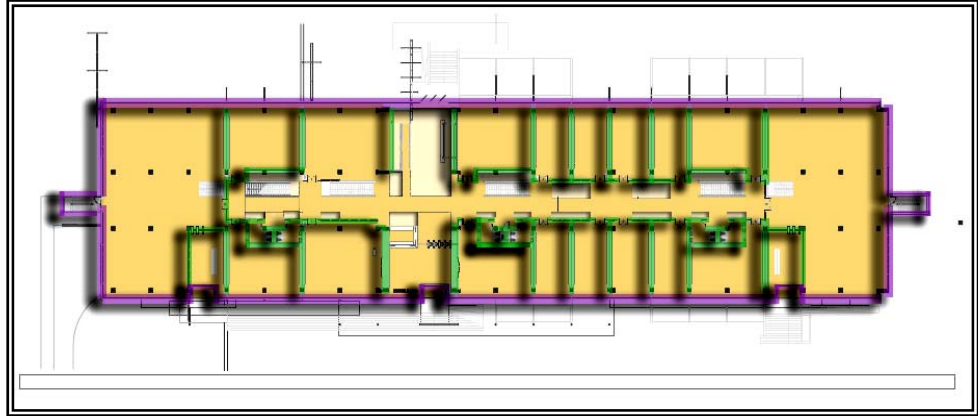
Adopted ground floor plan of METU Silicon Block.
